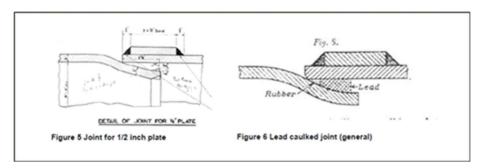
Indicative Joint Details of Pressure Tunnel. (Aecom, 2017)
